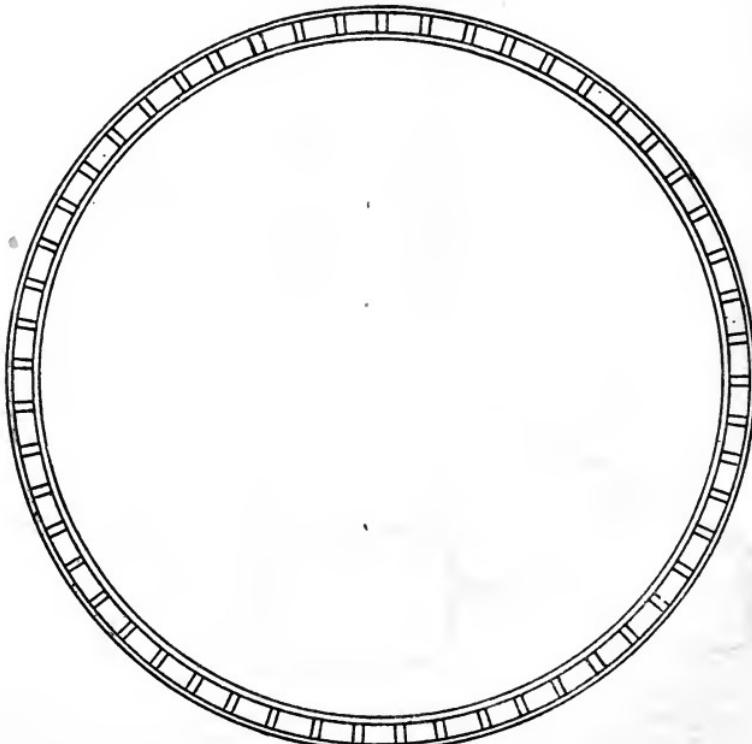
Showing the plan of studding for the all-wood, brick-lined or lathed-and-plastered silo.
